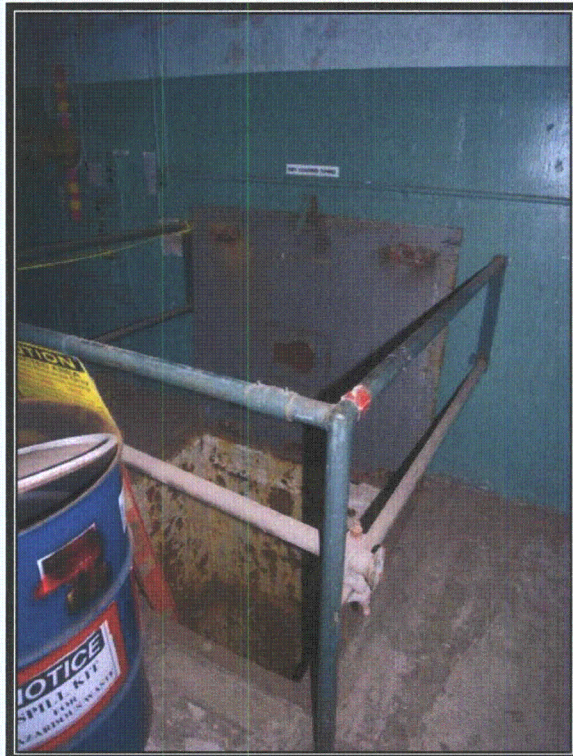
Access hatch to dry-loading tunnel (Photograph by RCG&A, 2008)
